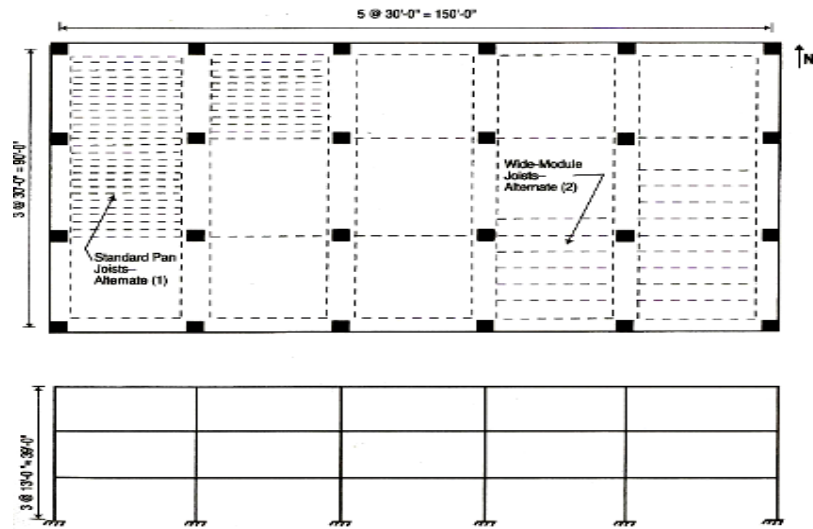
Plan and Elevation view of Prototype Building used in Study for Wind Tunnel and Wave Tank Testing
